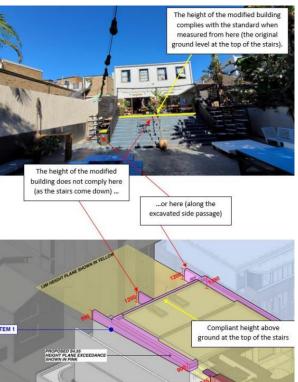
Rear yard of subject site, showing extant excavation and ground level of neighbour to the east, *Source: LK Planning.
